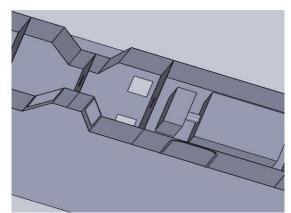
, Placement of machine, gearbox, and ducting lift (top view)
